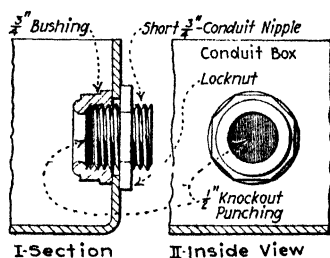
“Blanking” a knockout hole with a knockout punching, a bushing, a nipple and a locknut. No inspector can decline to pass this, whereas those methods which employ thin sheet iron are sometimes not accepted. For 1-in. conduit use a $\frac{3}{4}$ in. punching.
